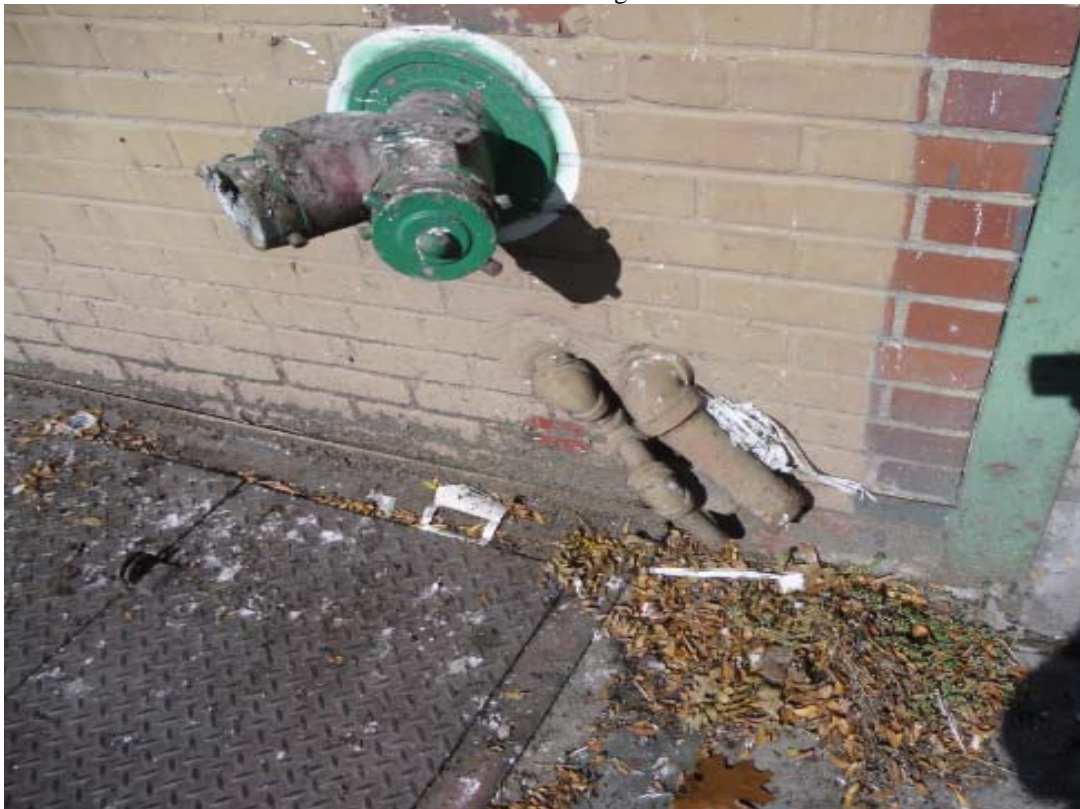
Close up view of basement, Siamese connection, and vents on front of 869 Grand Street.
